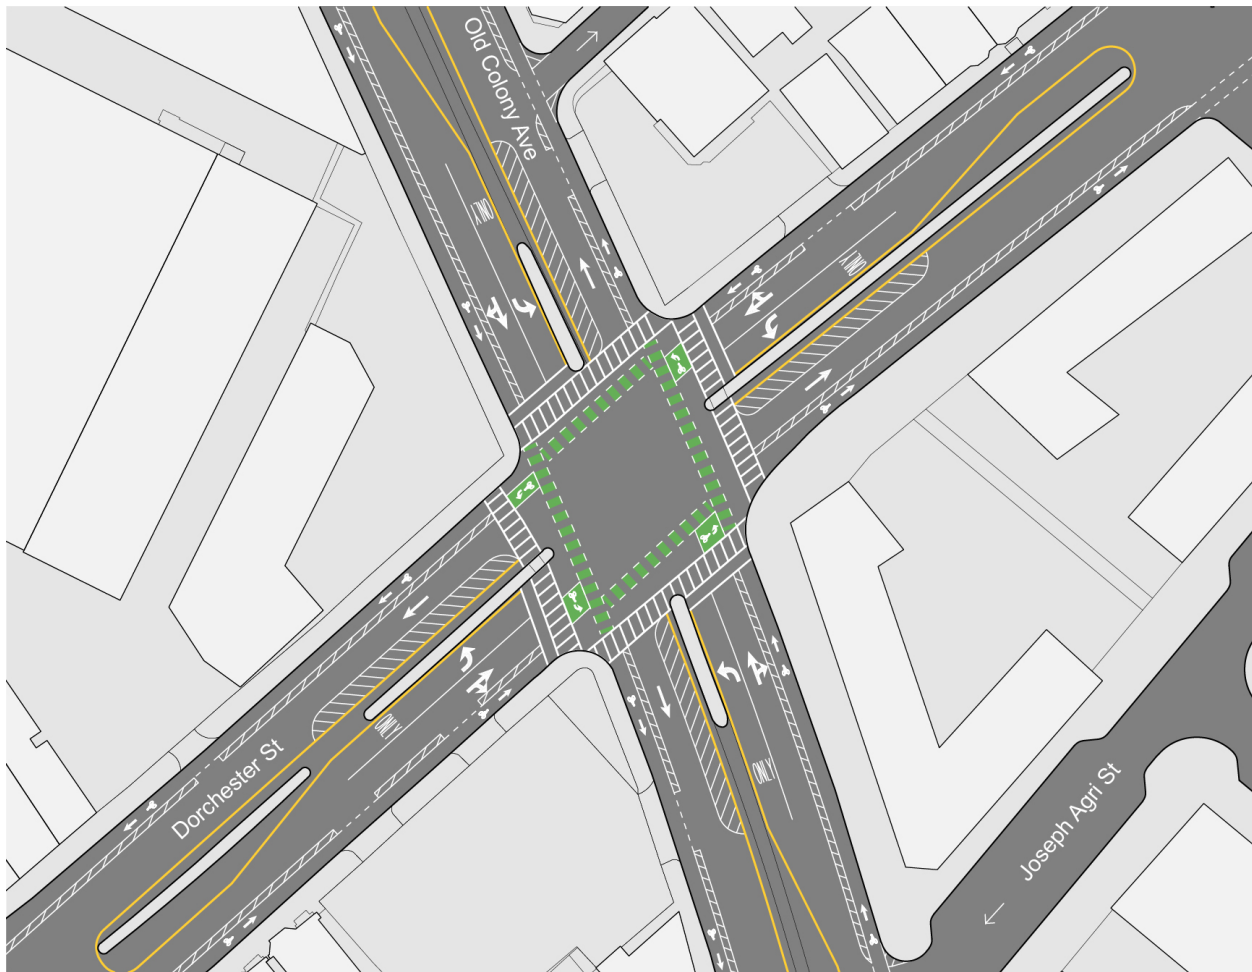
Dorchester Street and Old Colony Intersection Short-Term Improvements - Plan View
